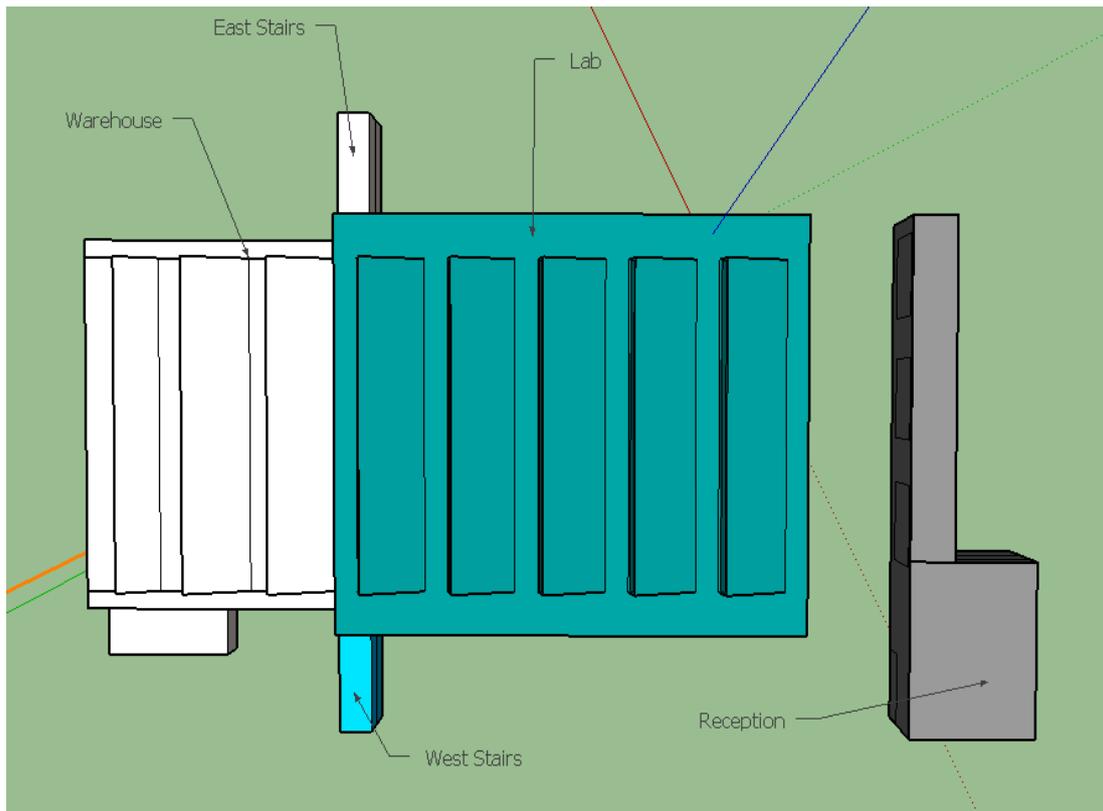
Division of the building structure into various thermal zones - Ground to 1st floor
